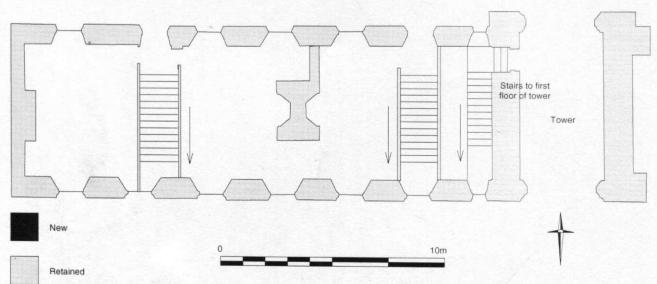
Proposed Ground Floor Layouts Within the Grammar School Range
